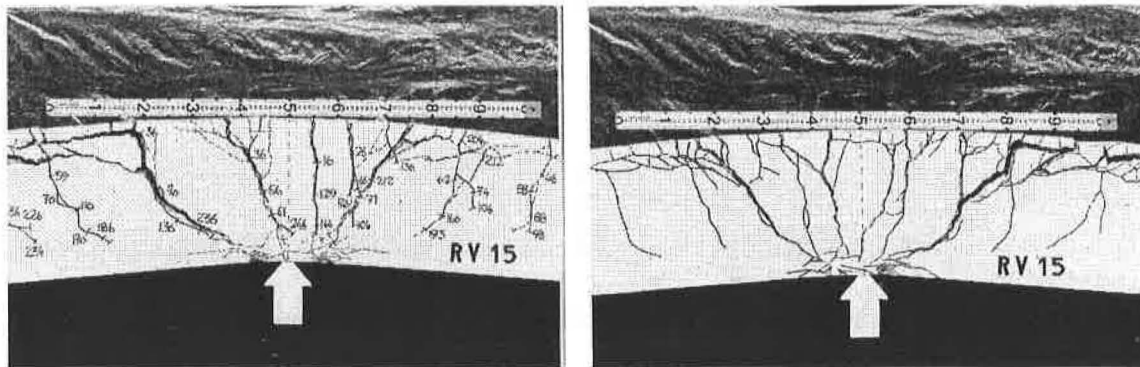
Final crack pattern of specimen RV15. Side elevation.
